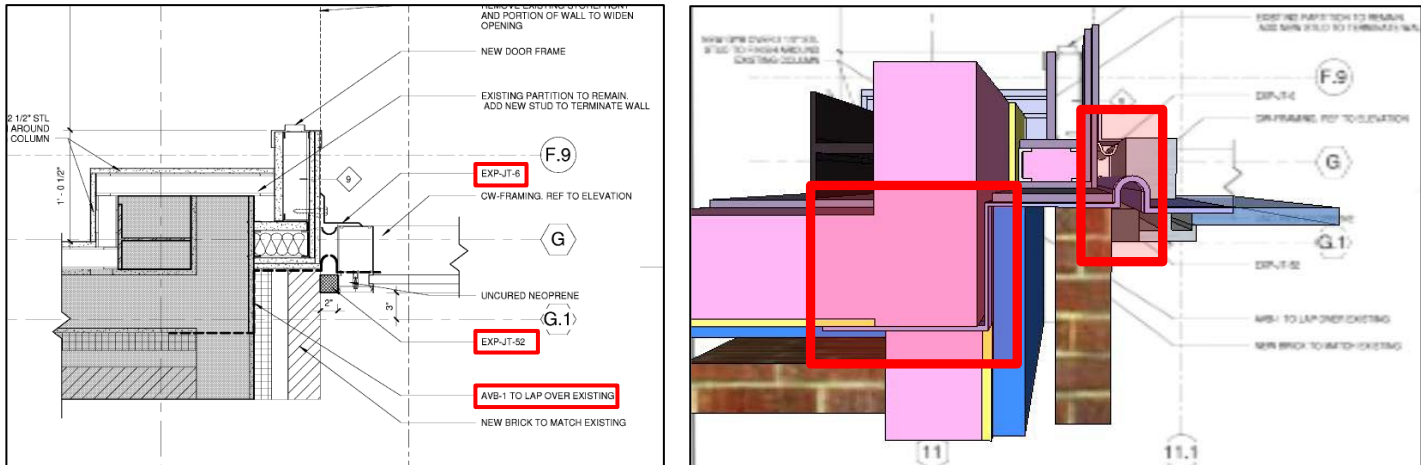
, *Left* - Original detail for the addition tie-in to the existing structure. The three main concerns with this detail are highlighted in red; the two expansion joints and air/vapor barrier. *Right* - Plan view of the same detail created in Google SketchUp. It is much easier to see the challenges with this detail, especially with overlapping the air/vapor barrier on the existing exterior sheathing and beneath the rigid insulation.
